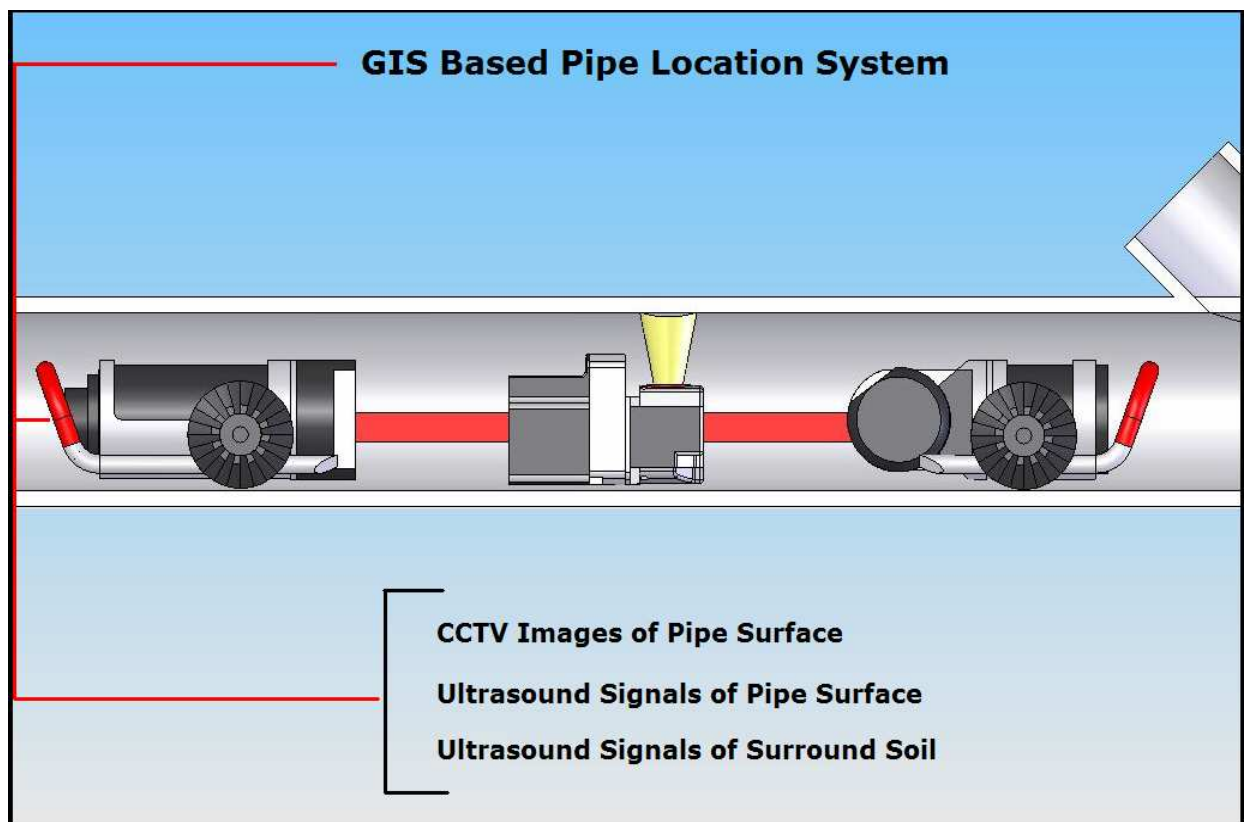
Proposed system for automated inspection of buried concrete pipe.
